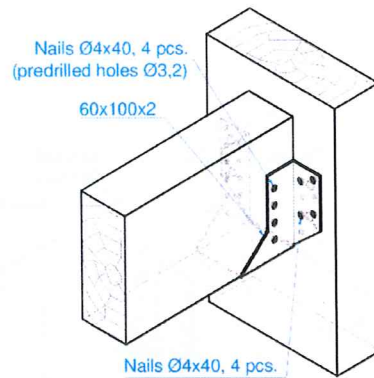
Number and position of nails in the timber beam to timber column connection with the joist hanger 60×100×2. Position of nails is symmetrical in both sides.
